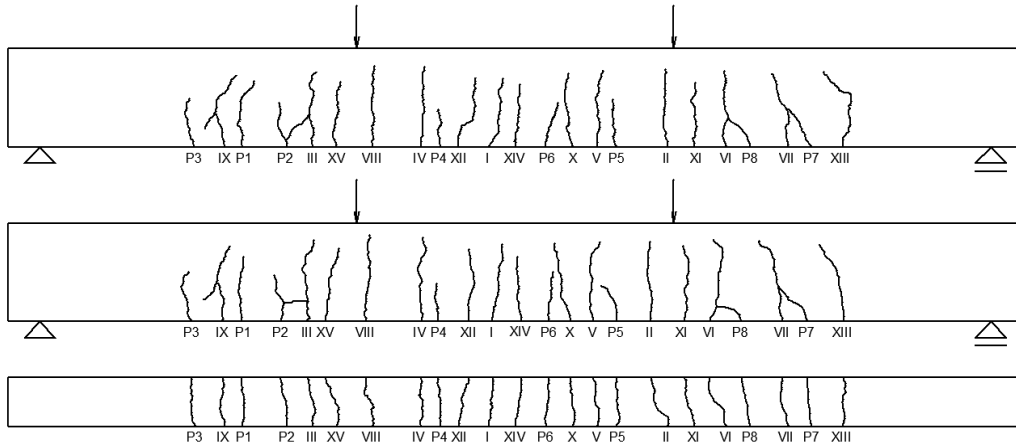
Scheme of cracks location on the bottom and both side surfaces of beam C1
